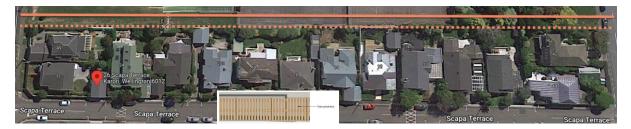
DISTANCE OF SOUTH BUILDING EDGE (SOLID LINE) FROM FENCE LINE (DOTTED LINE) AND SCAPA TERRACE HOUSES – WITH PLANNED FENCE TYPE
